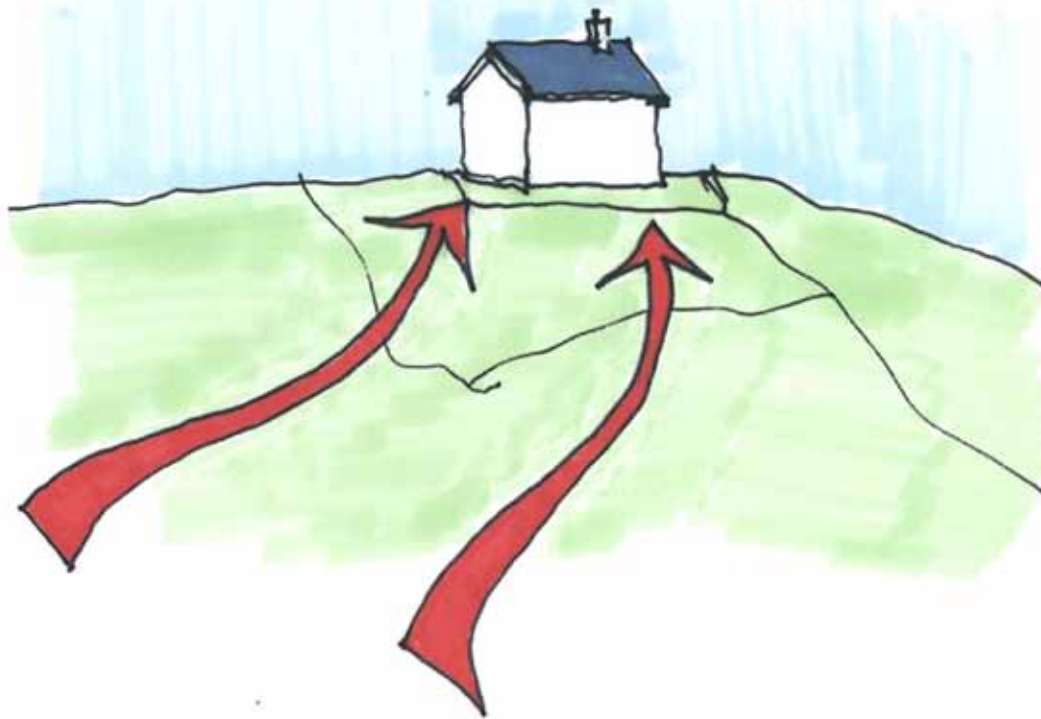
Avoid building on elevated unsheltered and exposed sites
